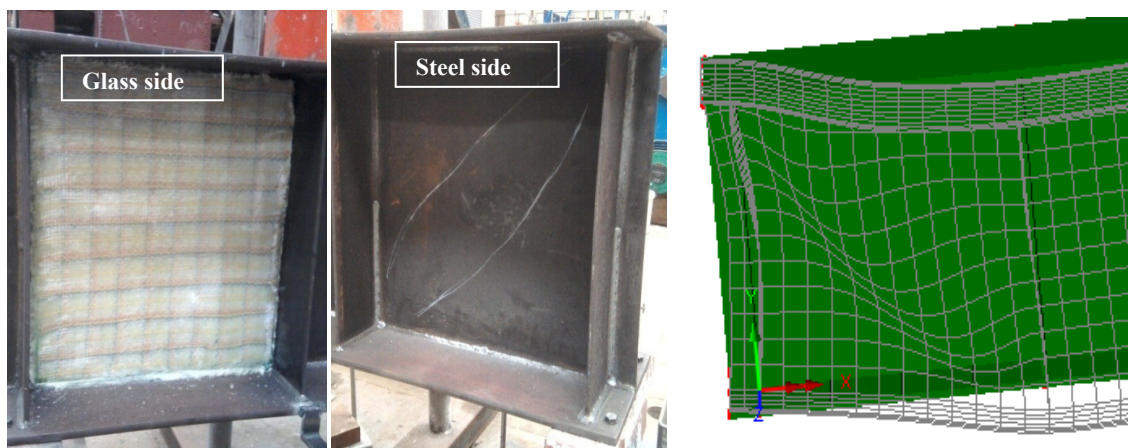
Test and FEA modes of failure of glass fabric-strengthened specimen B7
